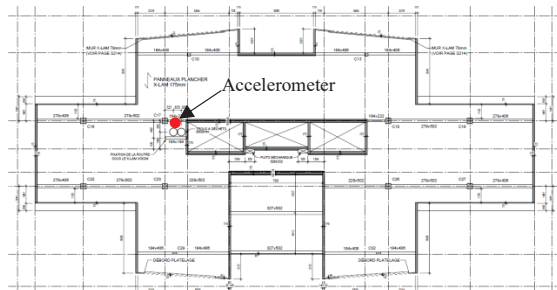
Location of the accelerometers on the ceiling of the top floor for the Origine building
